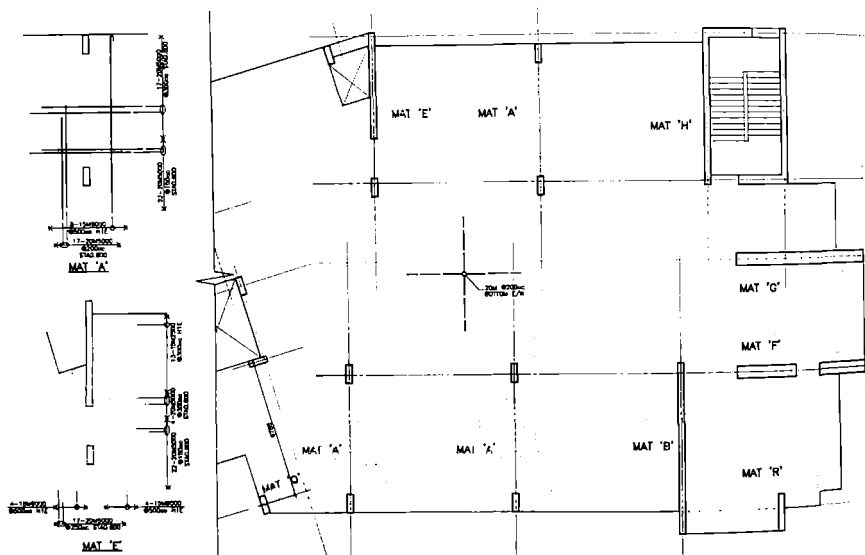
Reinforcement layout for the irregular flat slab example.
